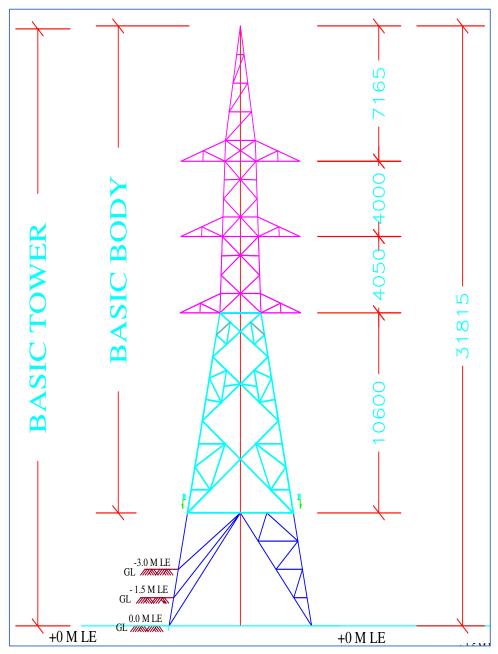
TYPICAL NEW TRANSMISSION LINE TOWER DESIGN
